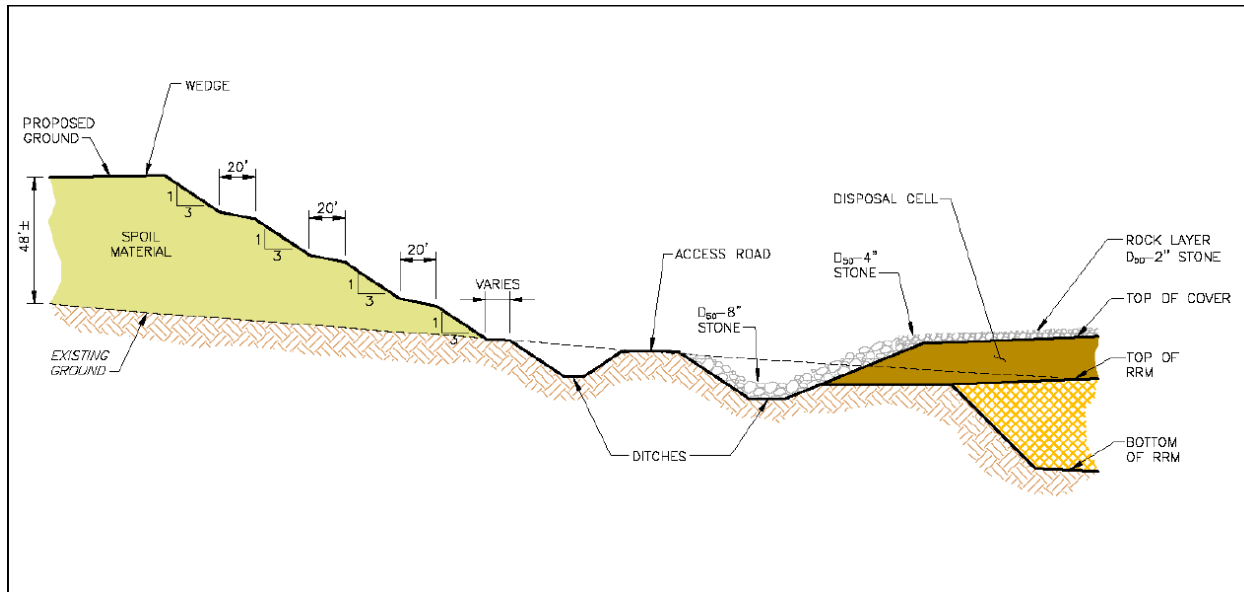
Cross-Section Through Wedge, Ditches, Access Road, and North Slope of the Disposal Cell. Image Credit: Figure 6-7 (DOE, 2008).
